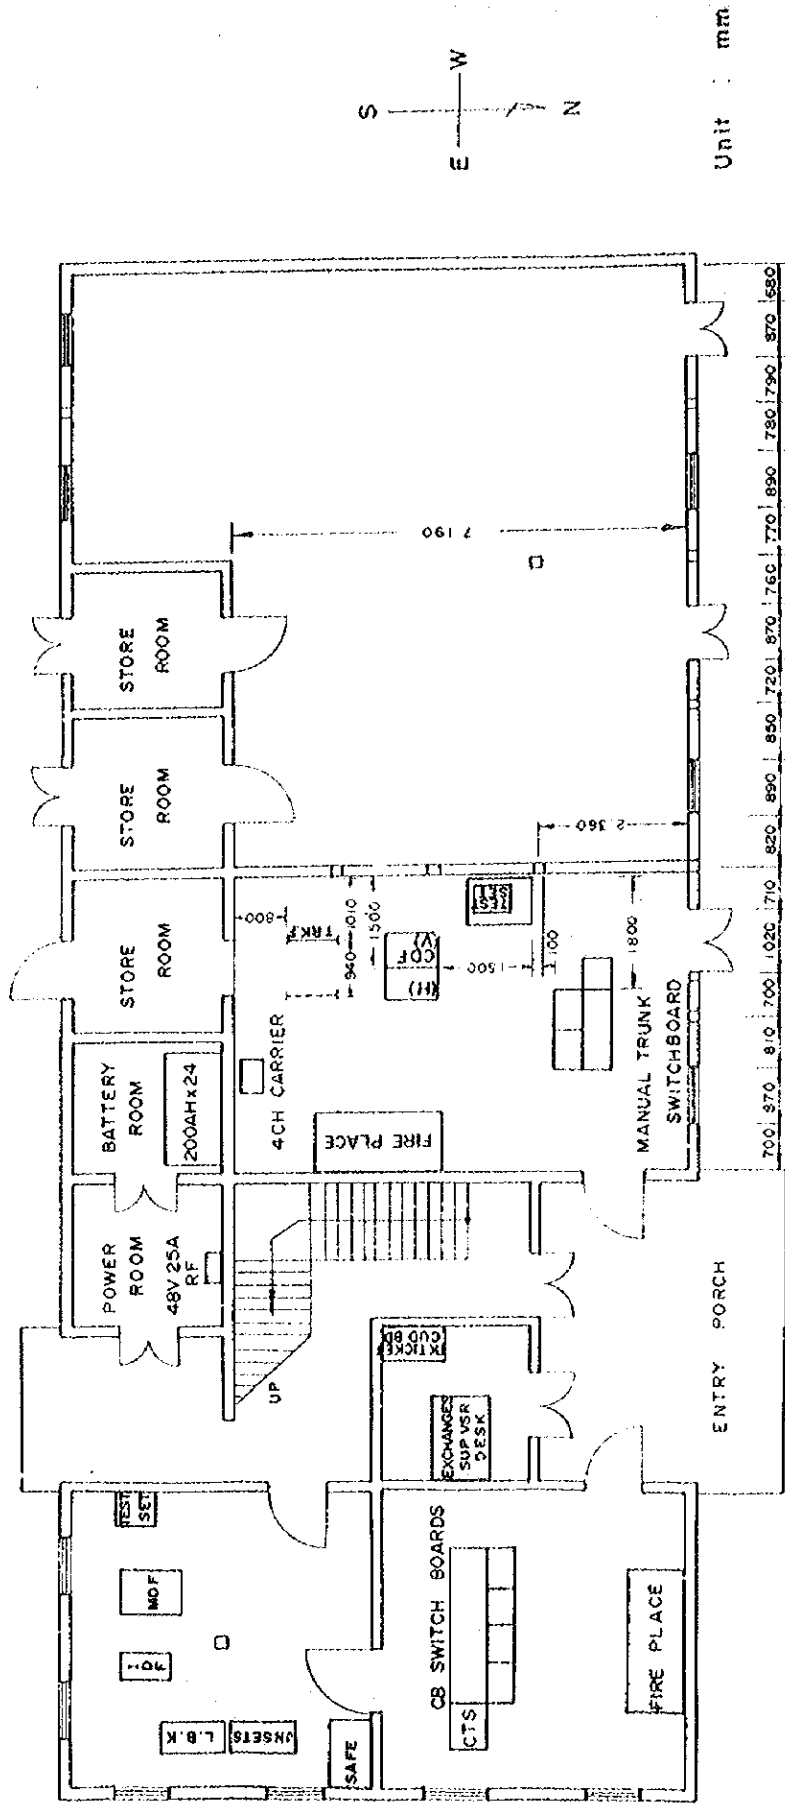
Floor Layout of Maymyo MDF Room
